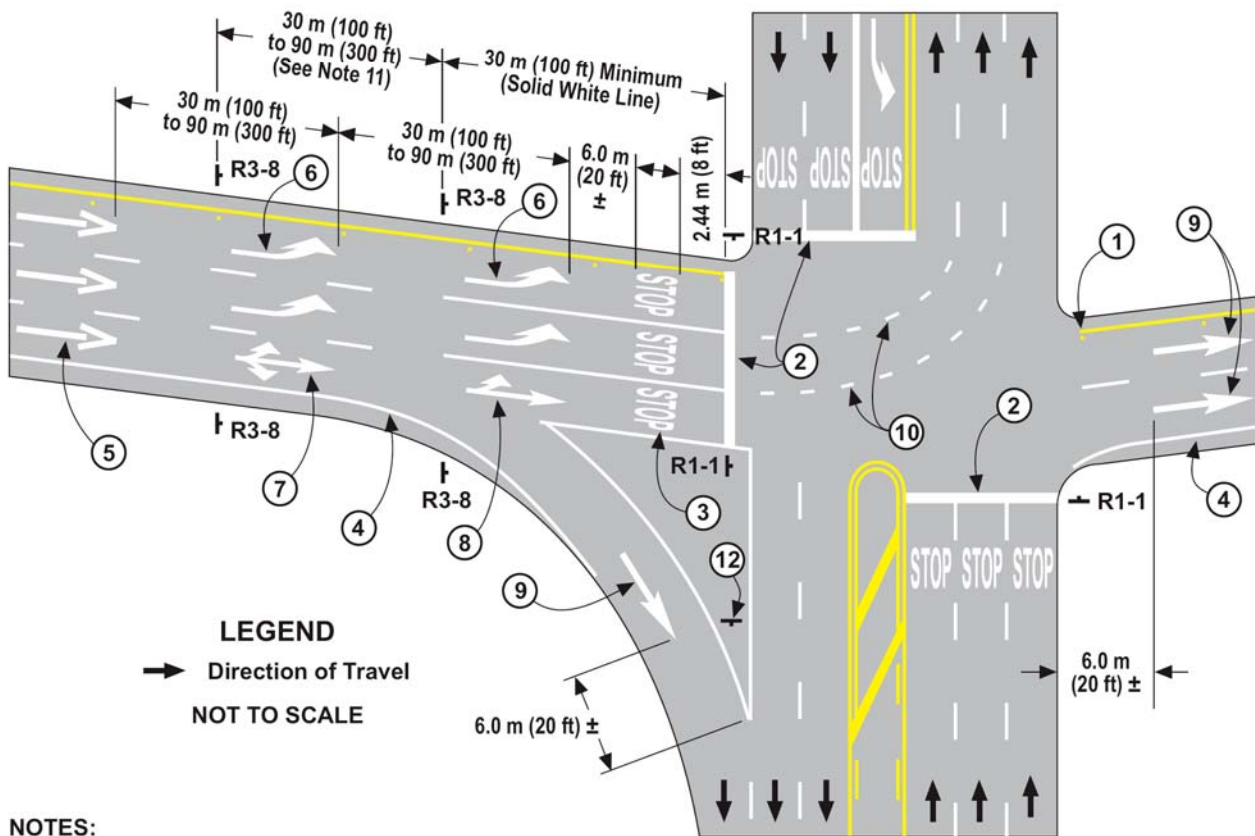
B-23 (CA). Examples of Entrance/Exit Ramp Terminal Signs and Pavement Markings (Sheet 4 of 6)
